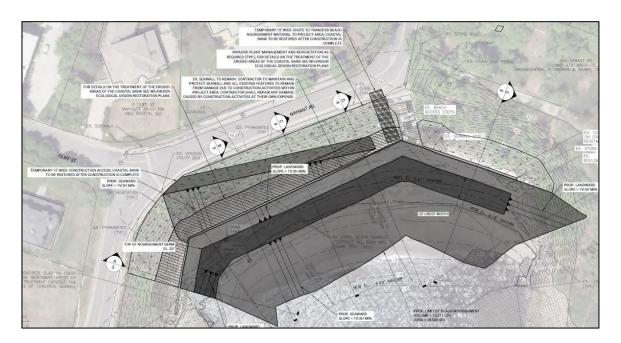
The proposed project plan illustrates the revised construction access ramp and sediment delivery chute.
